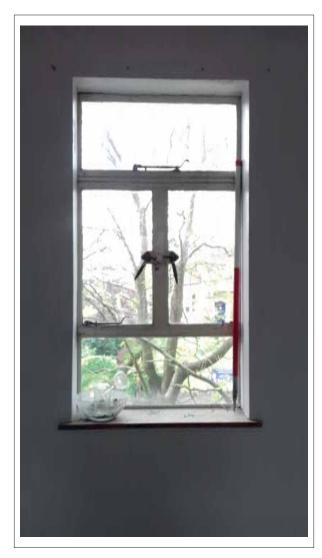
Window to west wall of Dormitory Area 2. 1m scales.
